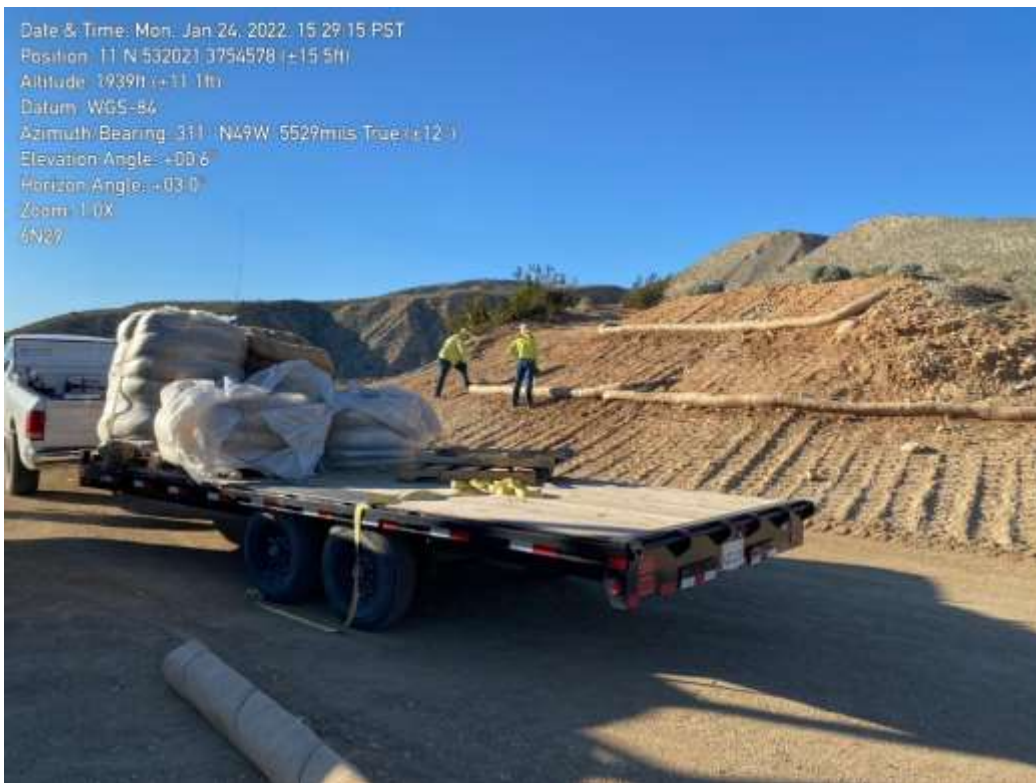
BMP installation at Construction Area 6N29, Segment 6 (January 24, 2022) (Photo courtesy of SCE).
